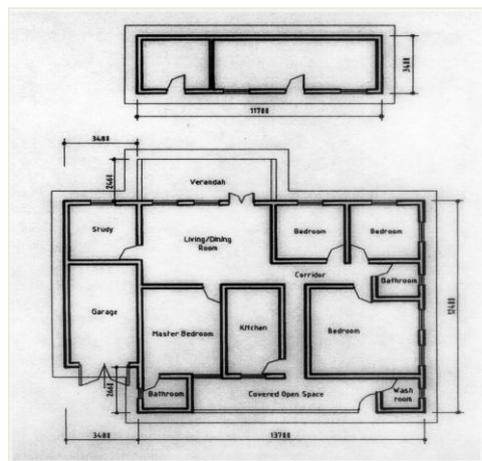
Plan of house in figure 2.17. Kitintale. (Drawing: author, 2002).
